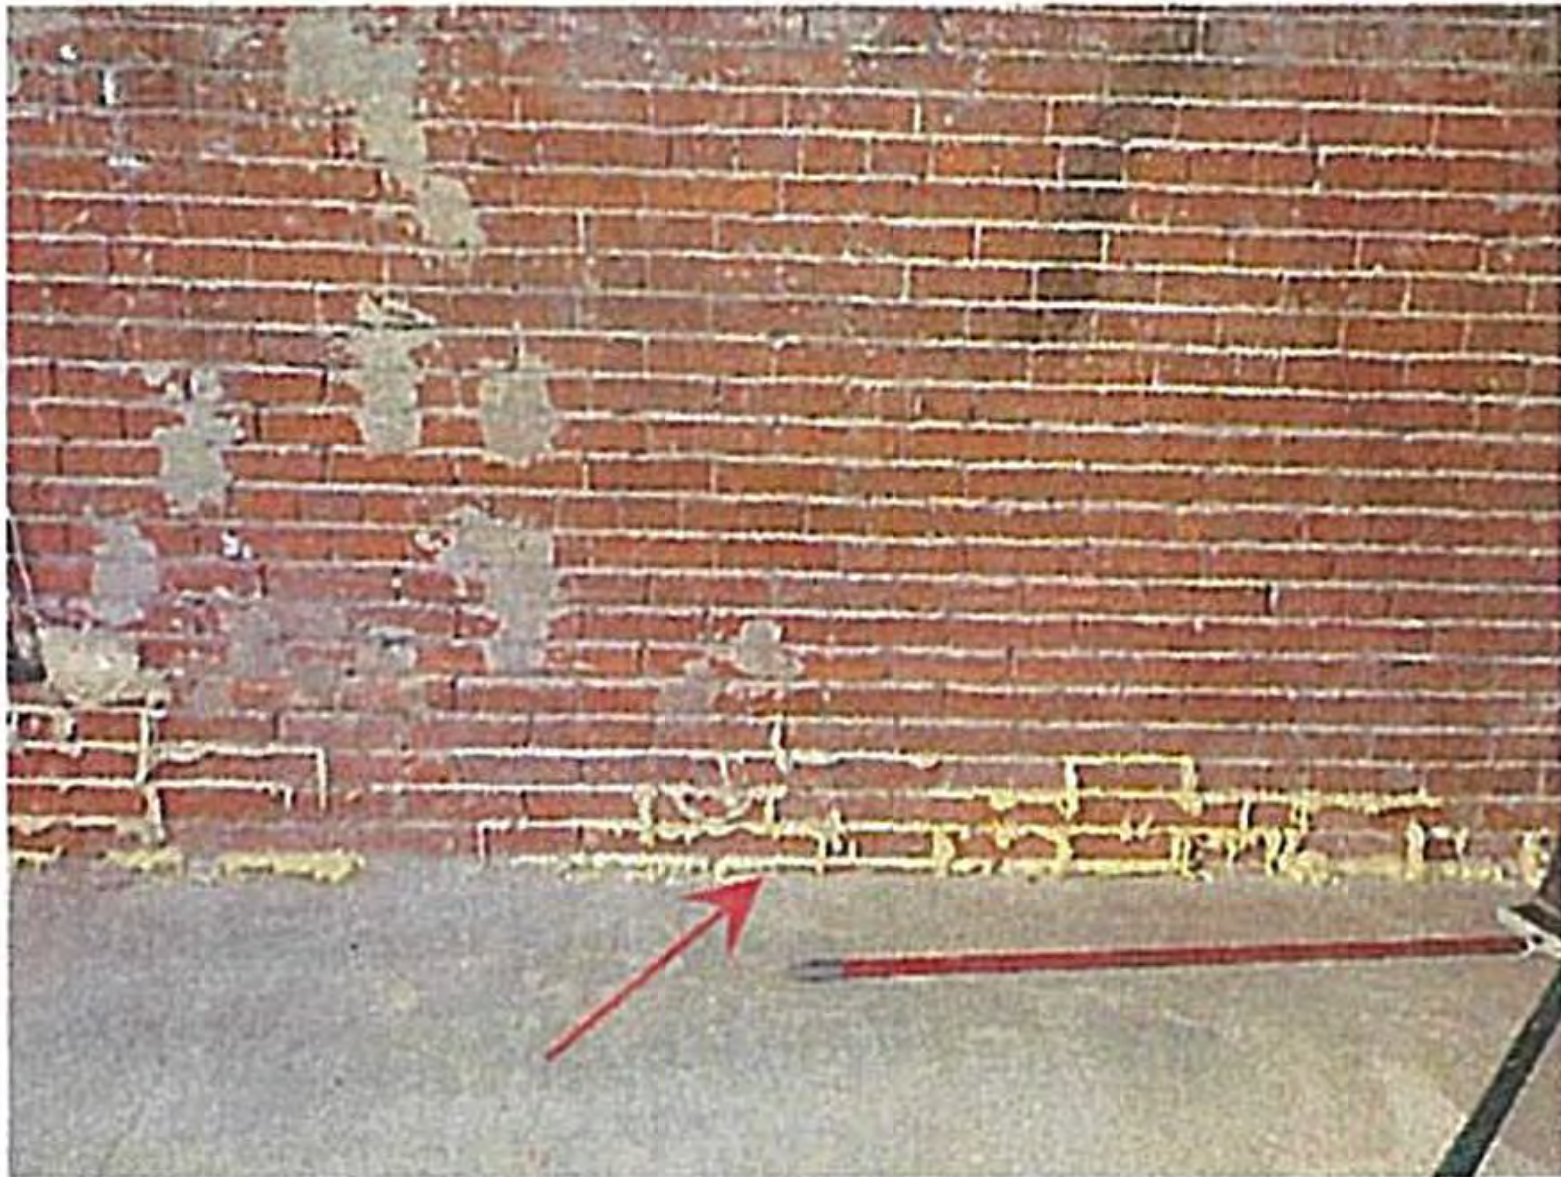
Basement of 504 structure, showing stone rubble footings, sinking foundation, and foam expanding insulation sprayed between bricks rather than appropriate mortar.
